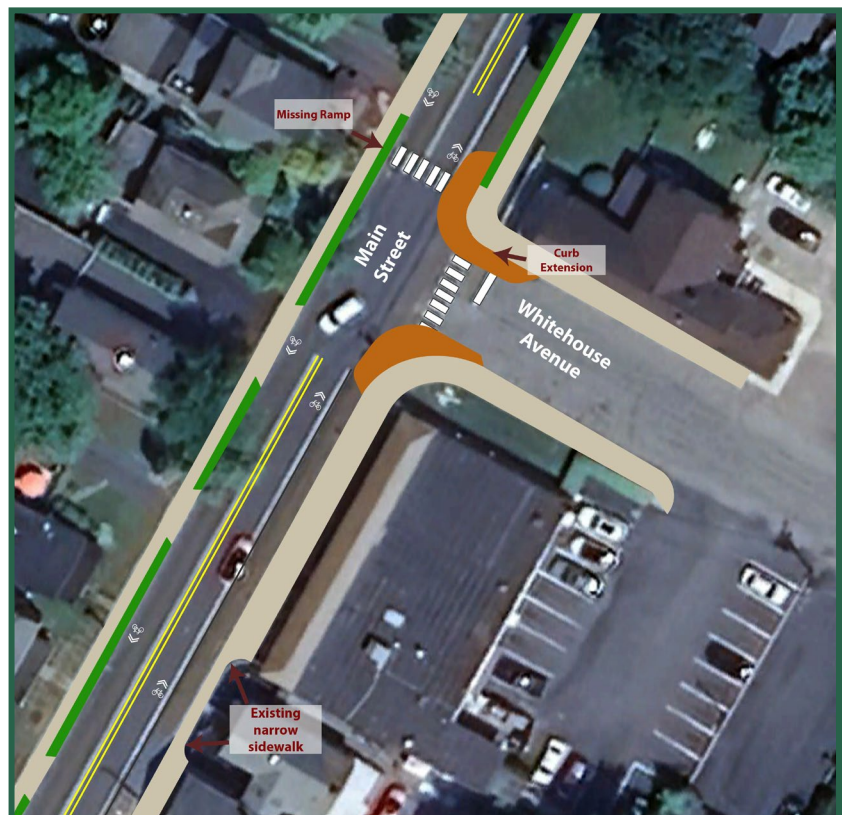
Railroad Avenue to Whitehouse Avenue Recommendations.
